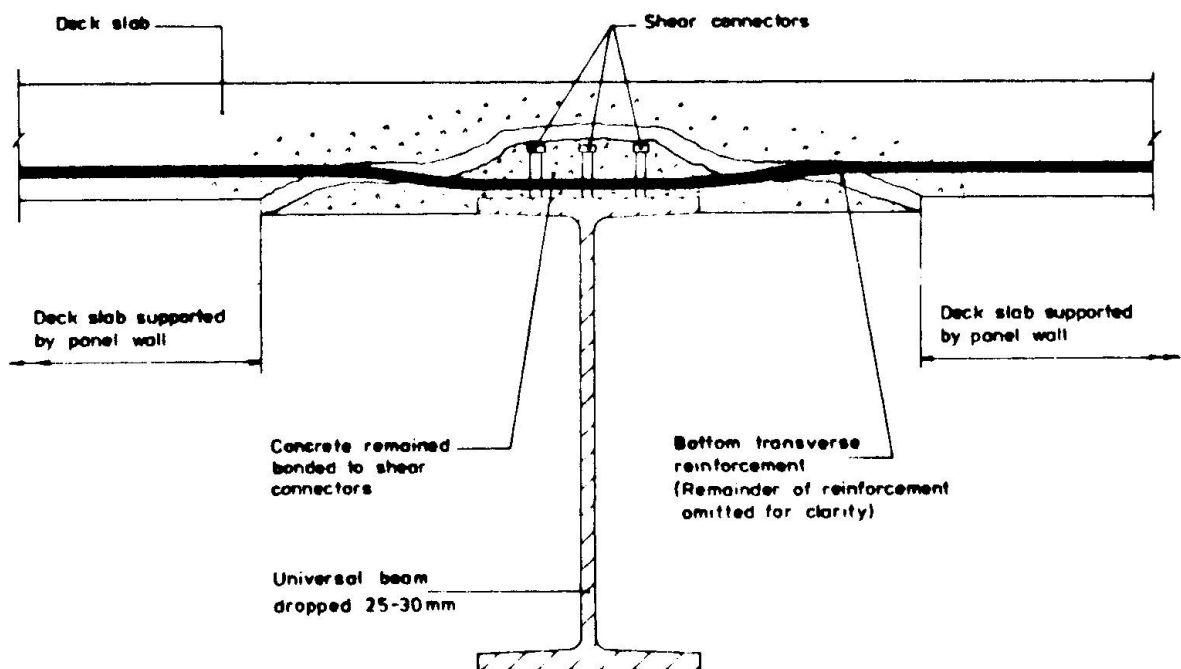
Midland Links Viaduct - Typical Cracking in Deck Slab over Beams
